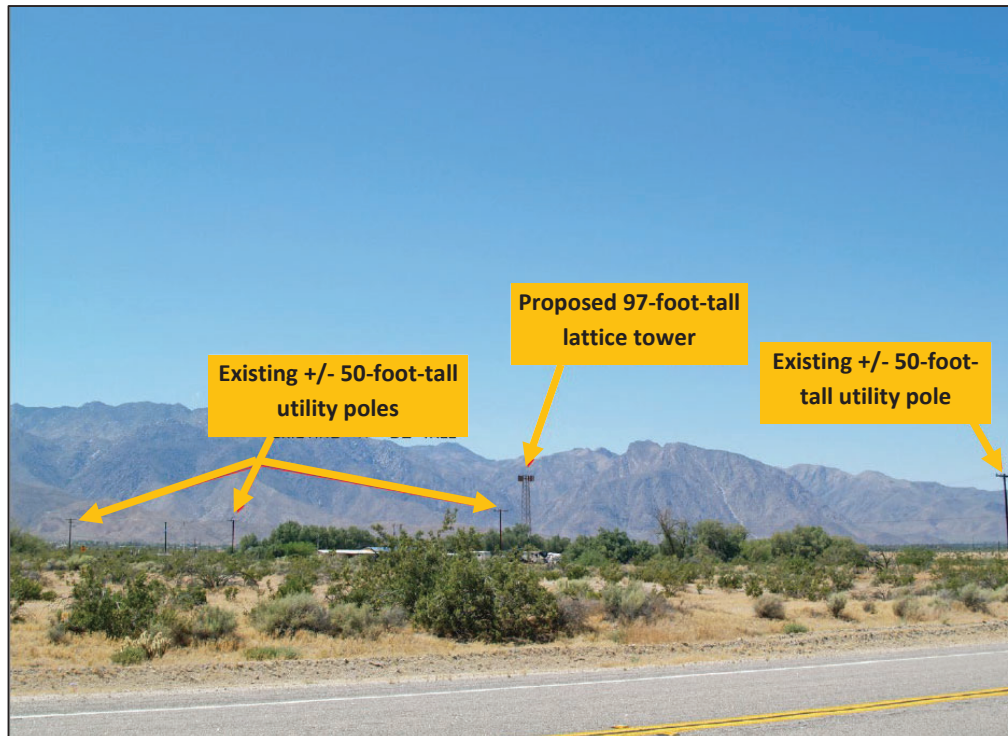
View of proposed 97' lattice tower, looking northwest from Yaqui Pass Road
